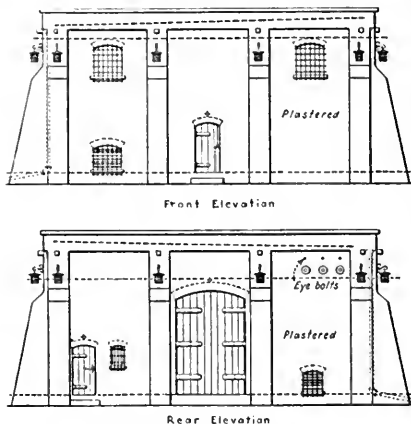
Elevations of Noiseless Substation showing Heavy Buttresses and Doors
